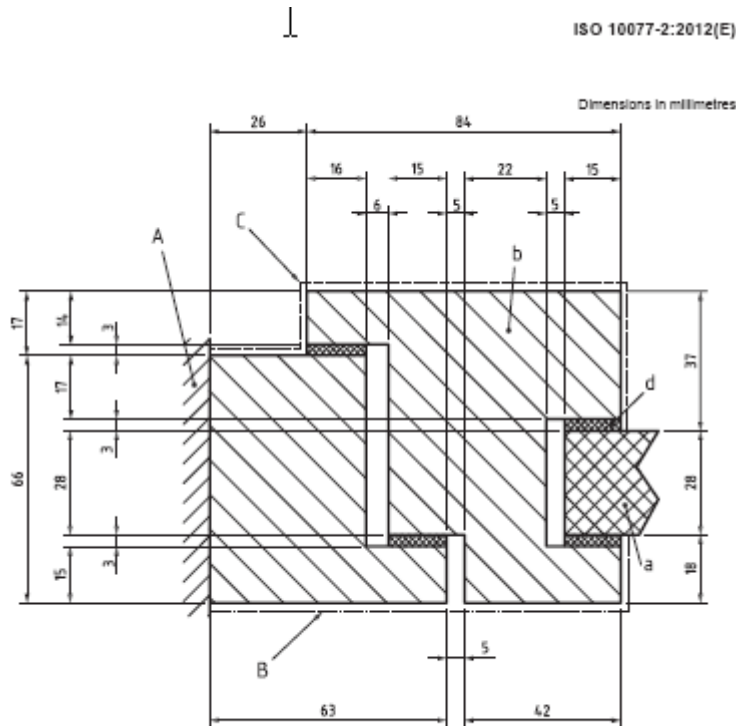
Wood frame section and insulation panel ($b_f = 110$ mm)
